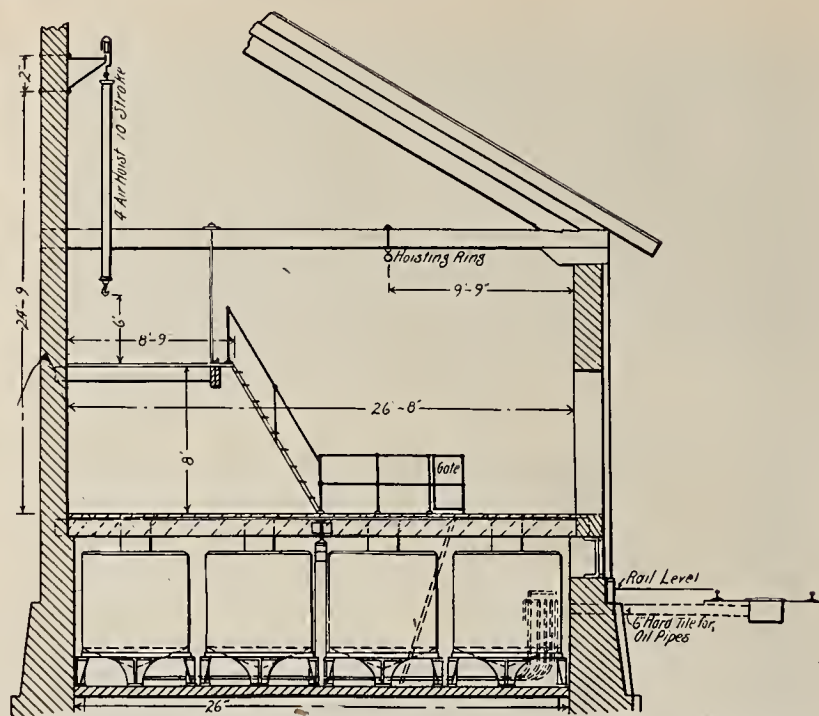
CROSS SECTION OF OIL HOUSE, ELKHART ROUNDHOUSE.
